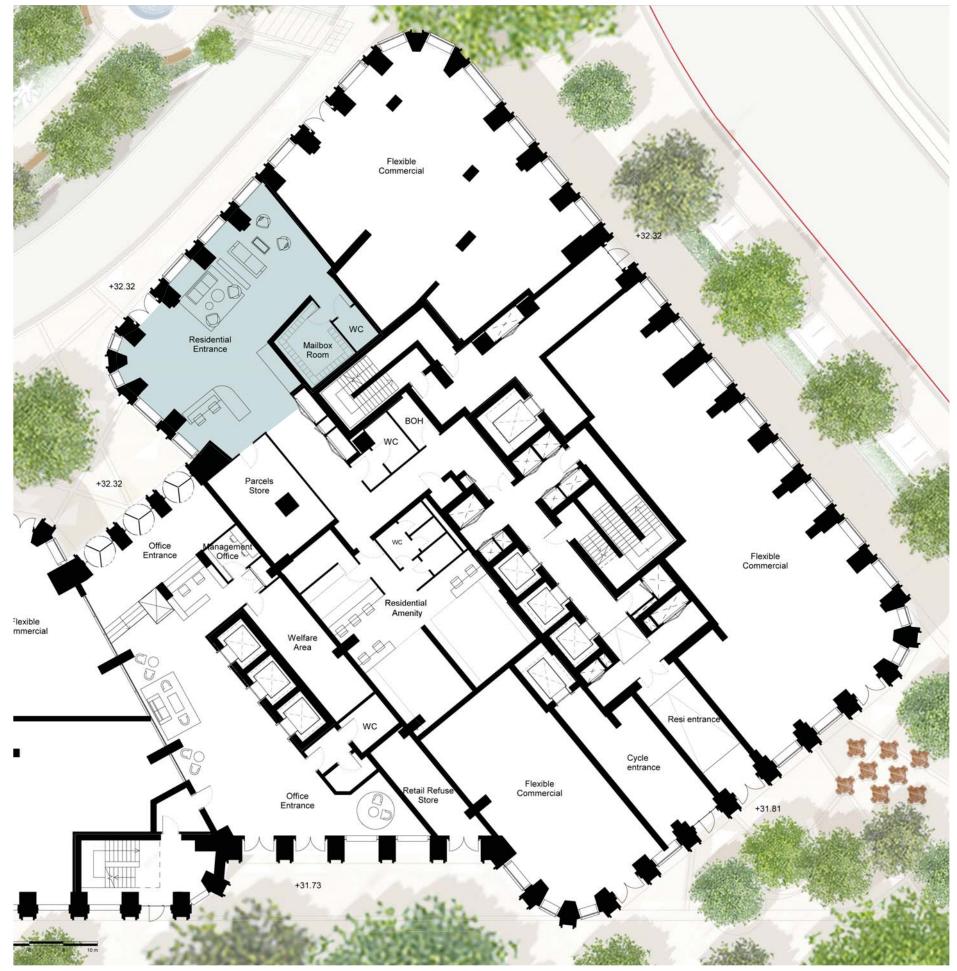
Block K Ground Floor Plan - Residential Reception Area
